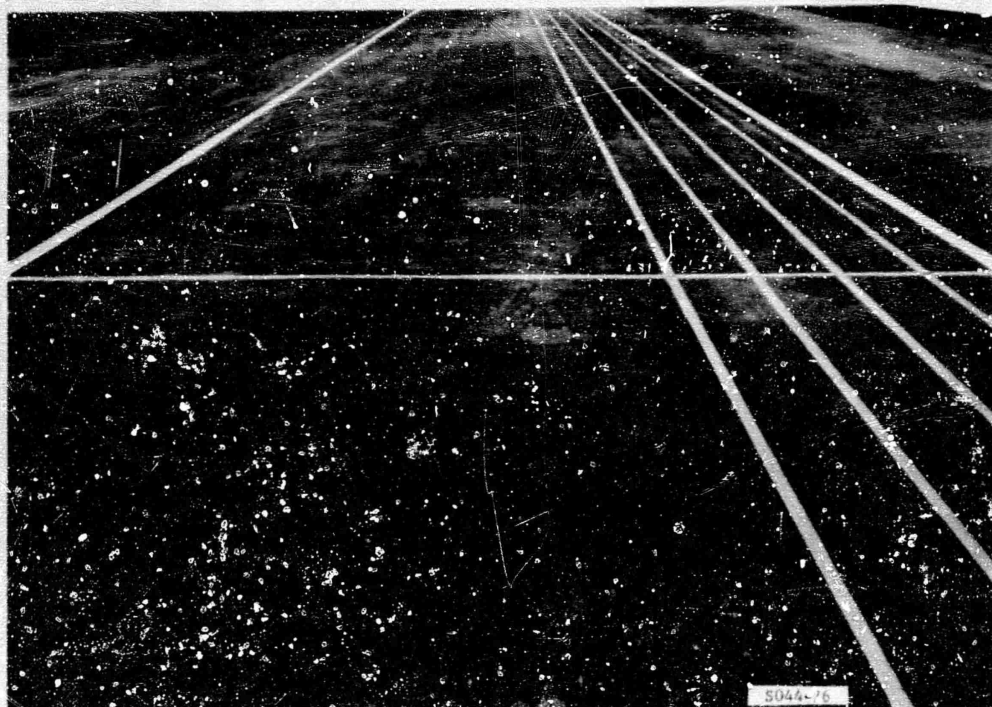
Typical View of Flexible Pavement Test Section Prior to Traffic
